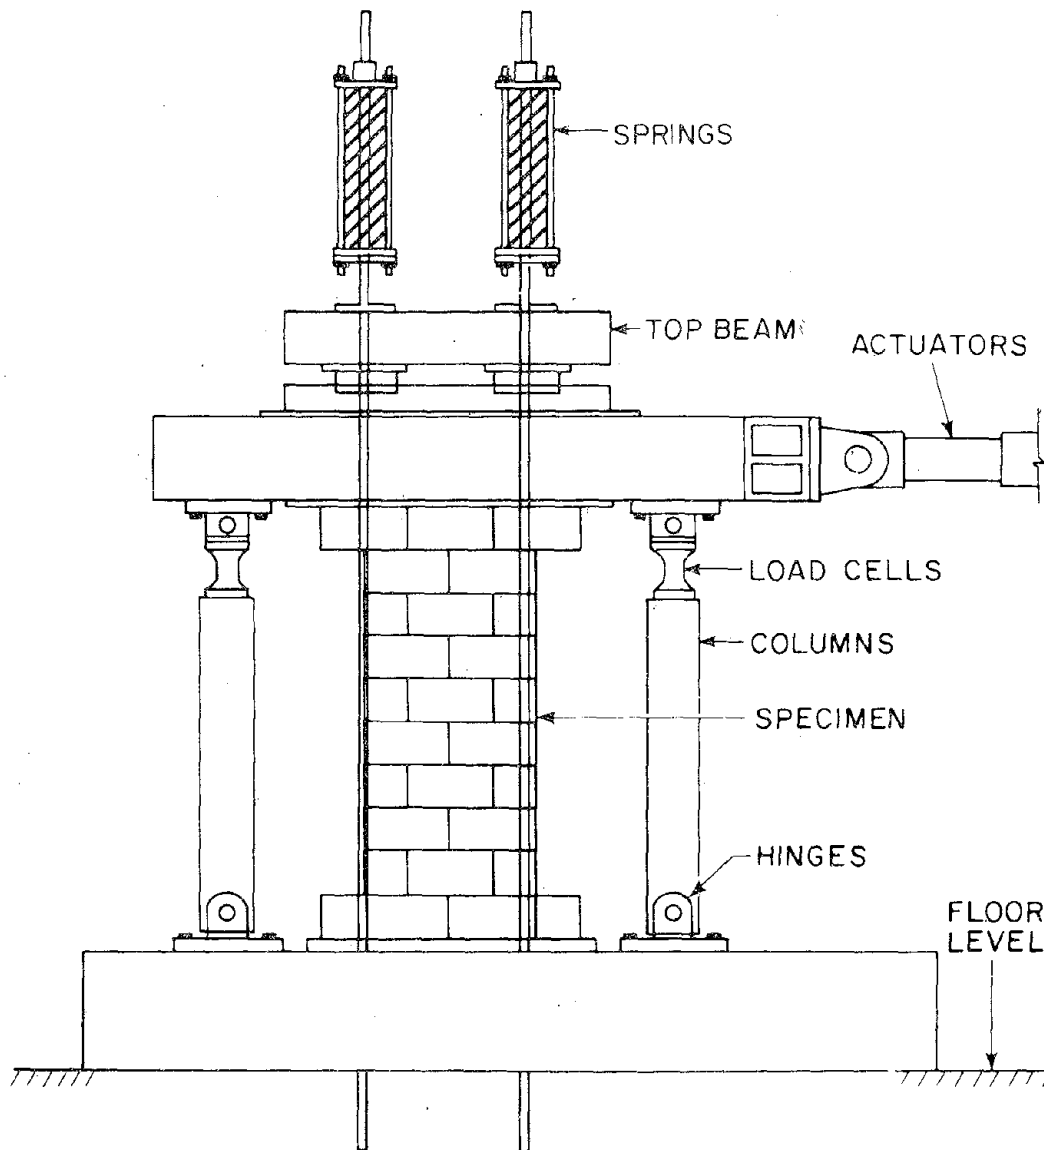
FIRST SINGLE PIER TEST SET UP
